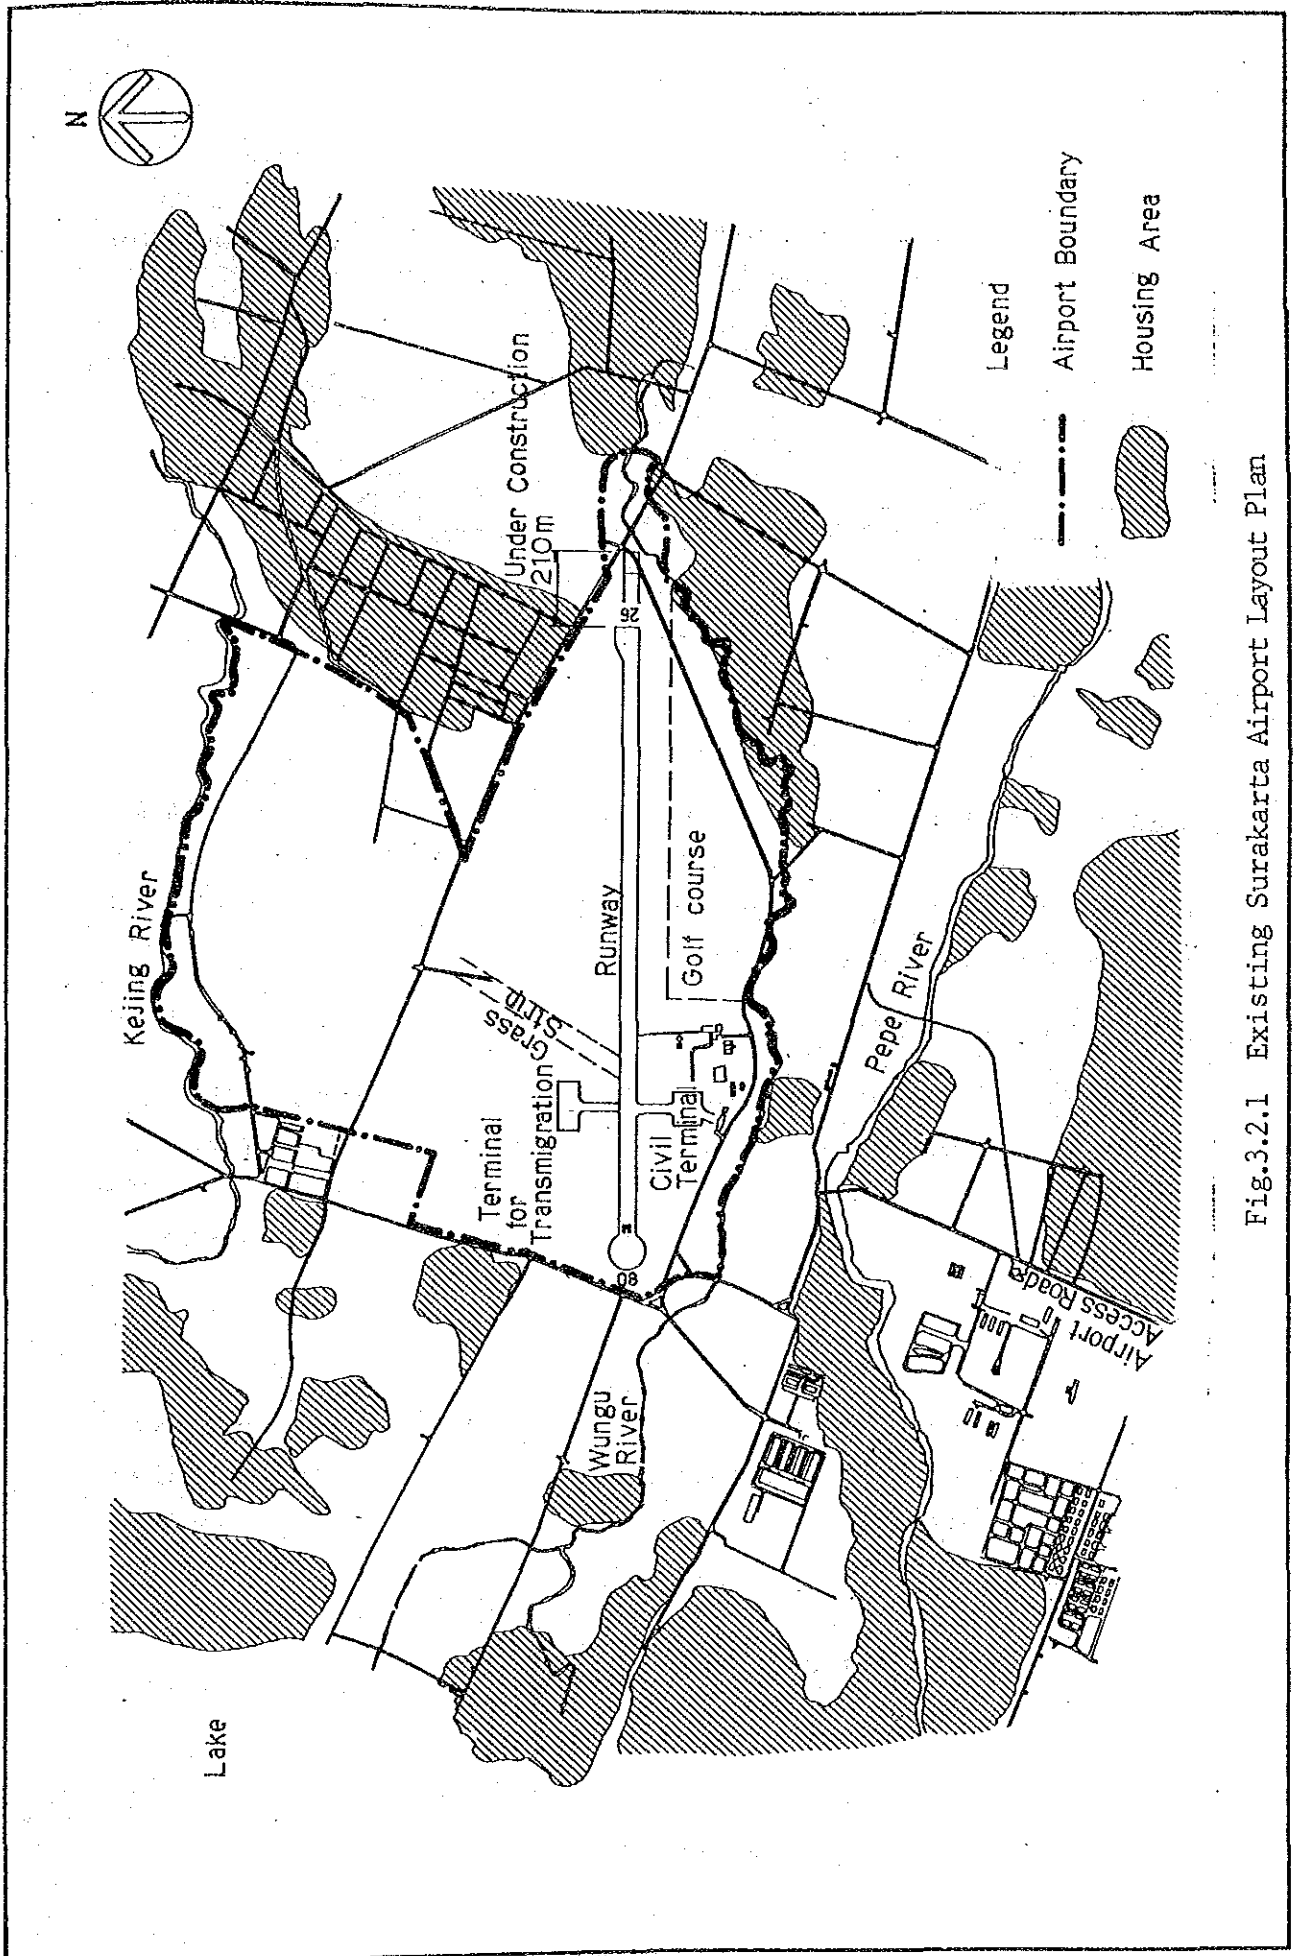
Existing Surakarta Airport Layout Plan
